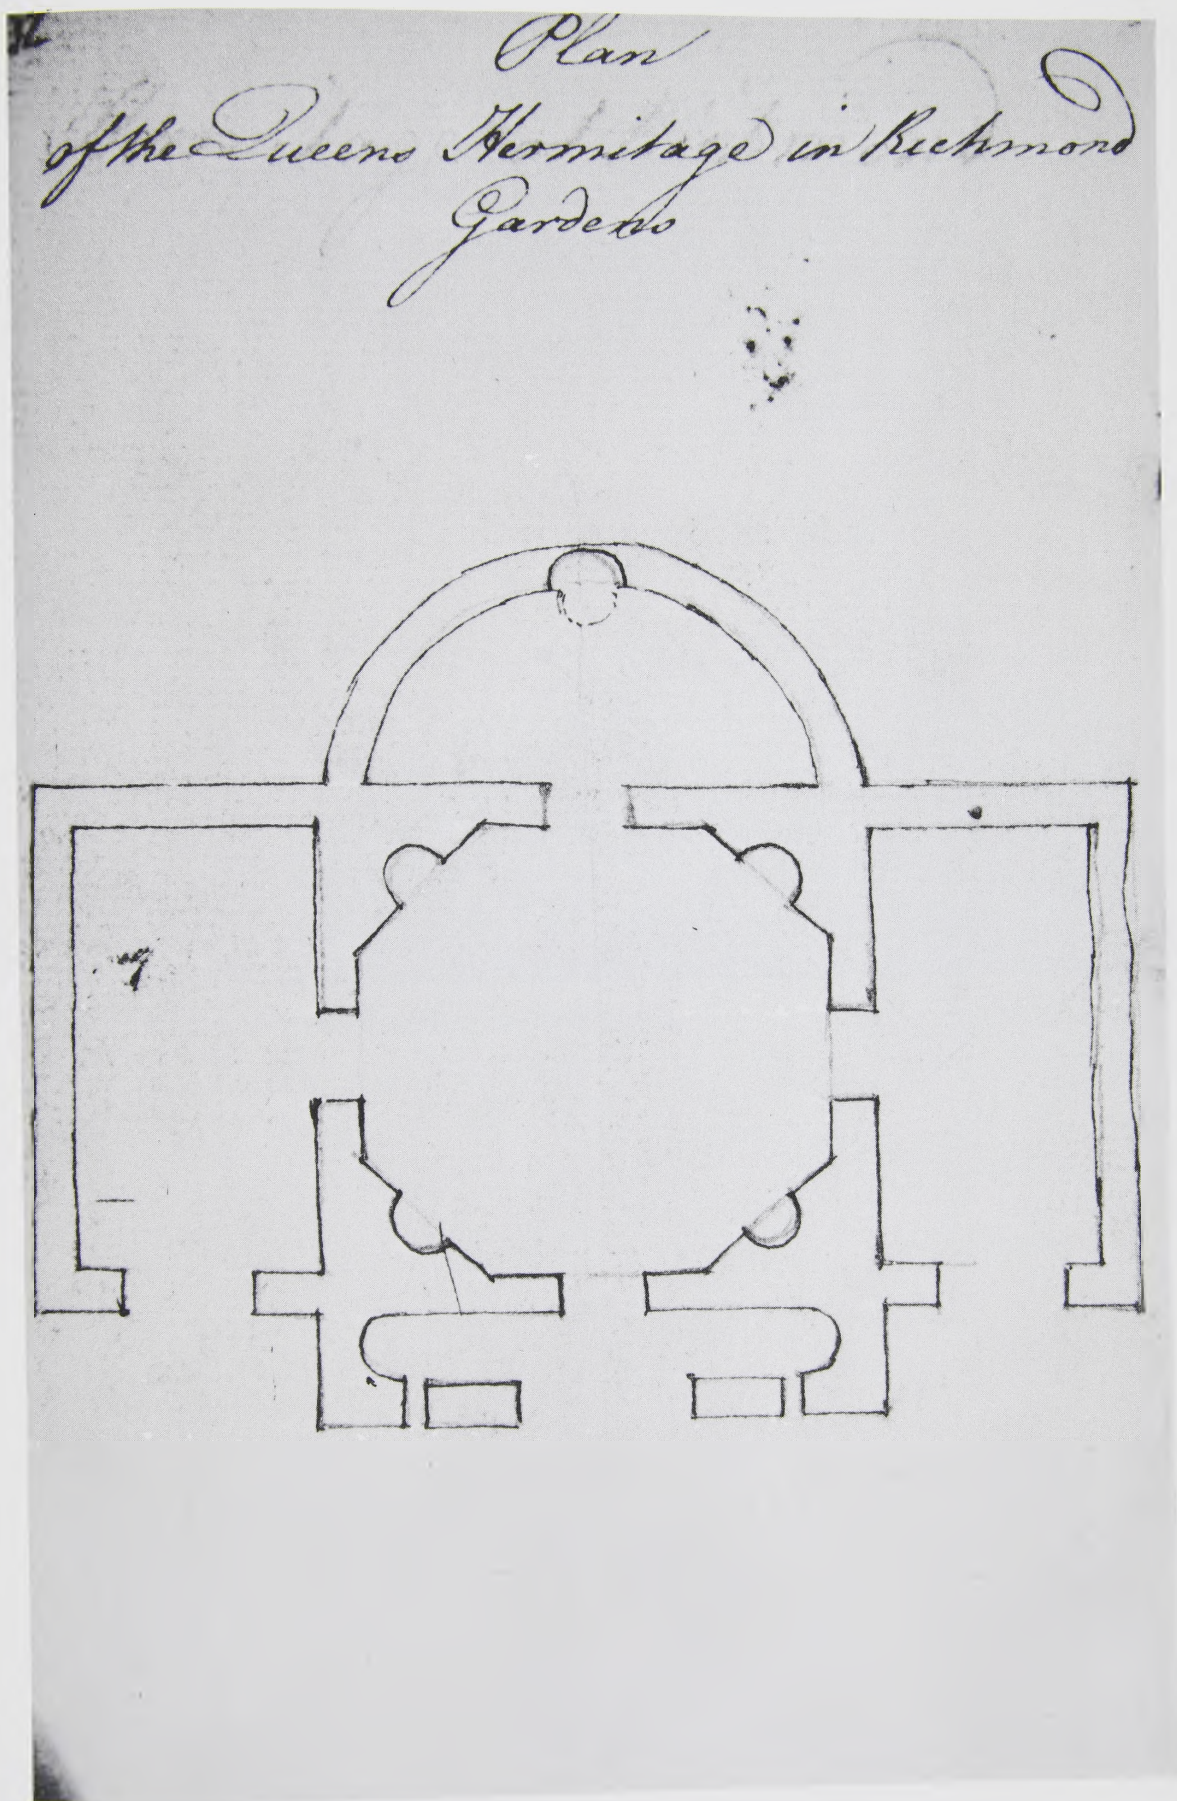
Robert Adam. Richmond Gardens (Surrey): Plan of the Queen's Hermitage, 1750
